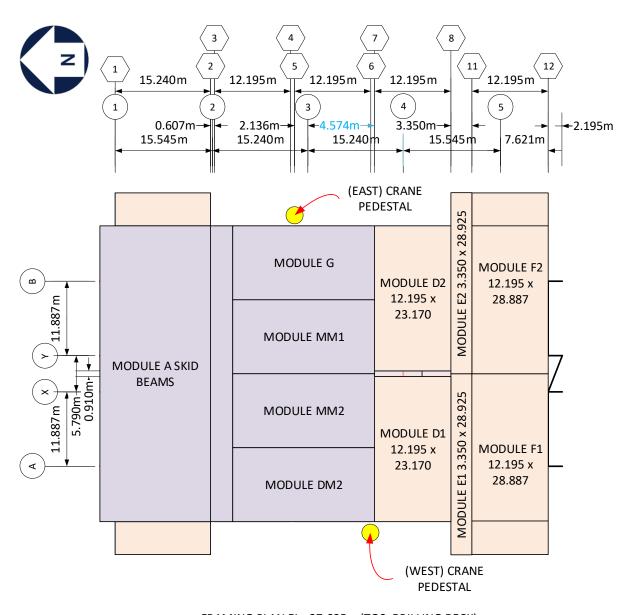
Framing Plan, Top of Steel, Production Deck EL+28.880m
